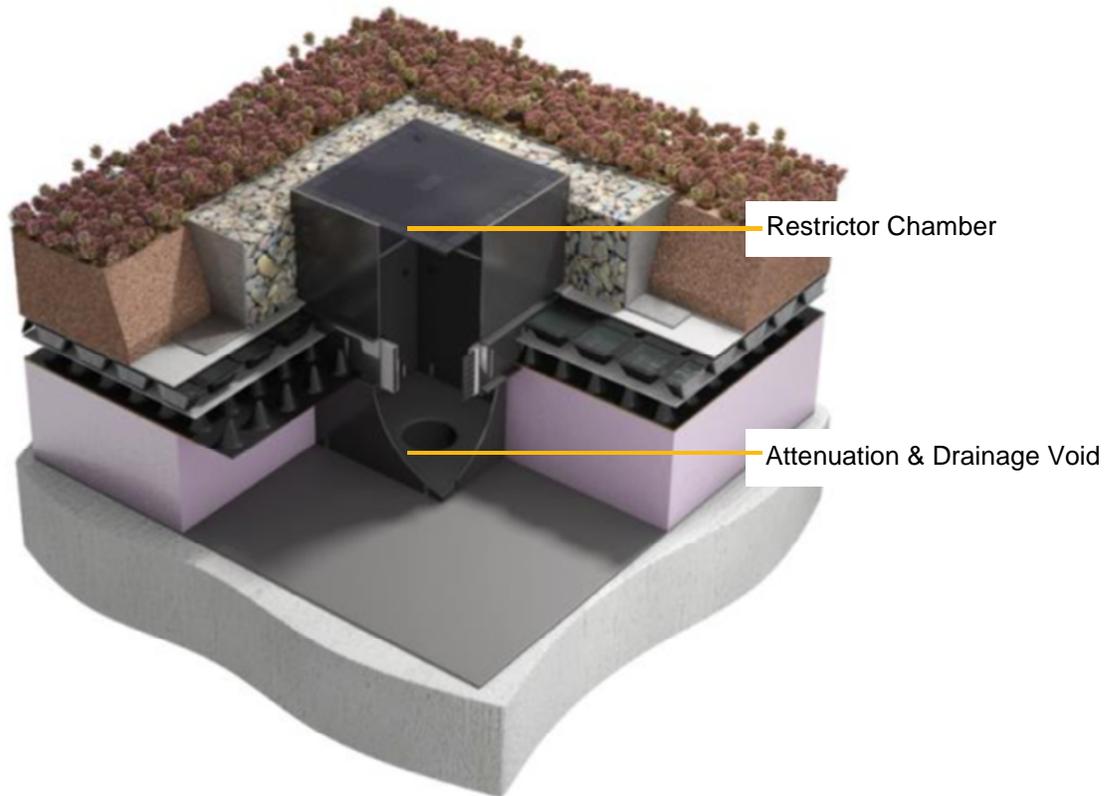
Cross-section of ABG Geosynthetics Blue Roof system: Source: ABG Geosynthetics
